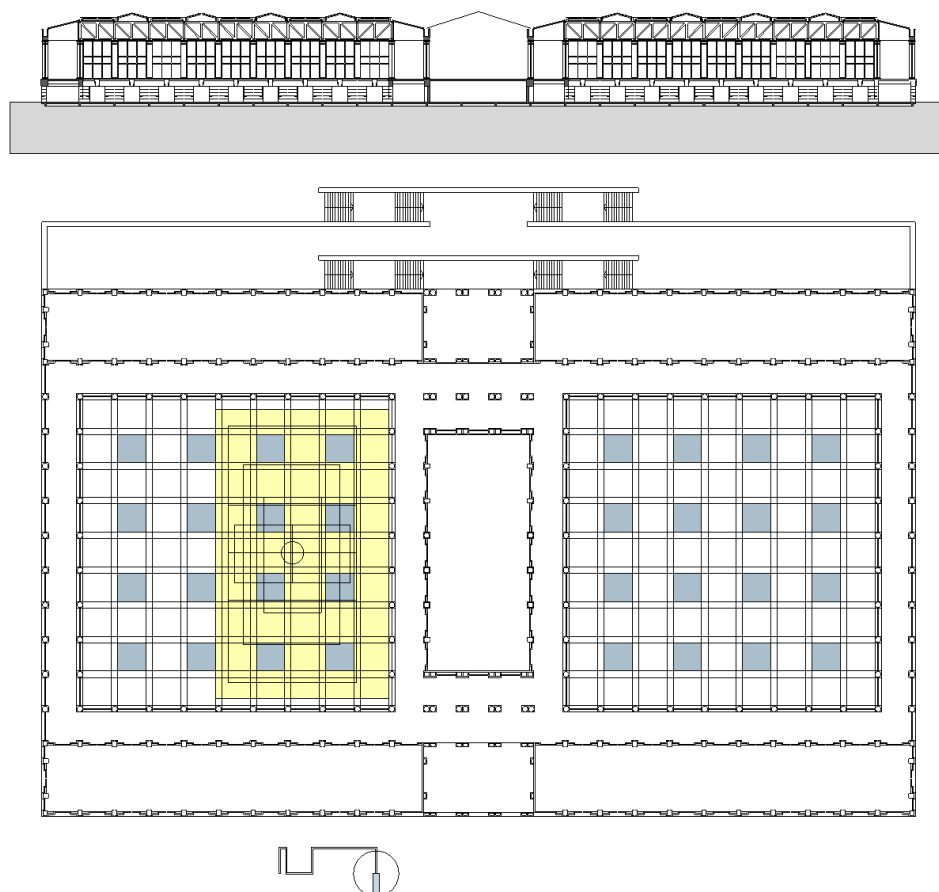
Floor plan and cross section (West - Est) of Institut Nacional d'Educació Física de Catalunya Montjuïc-INEFC building.
